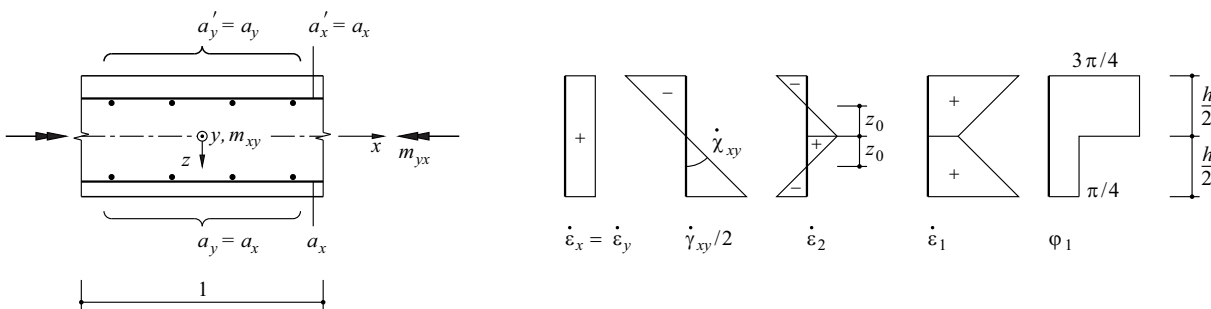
Symmetrically reinforced slab element subjected to pure twist
